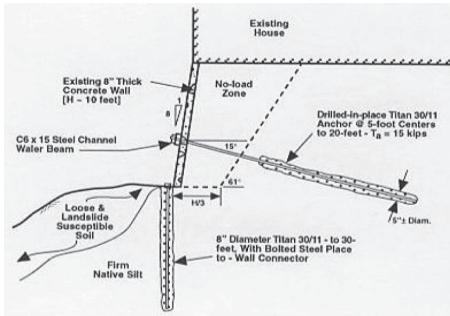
Schematic of underpinning and anchorage of existing concrete wall.
